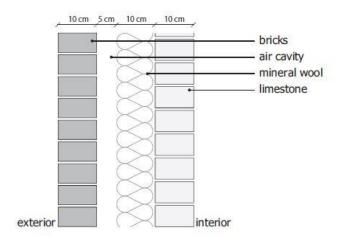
Bare wall with material layers (Ottelé, M. et al. 2011)
